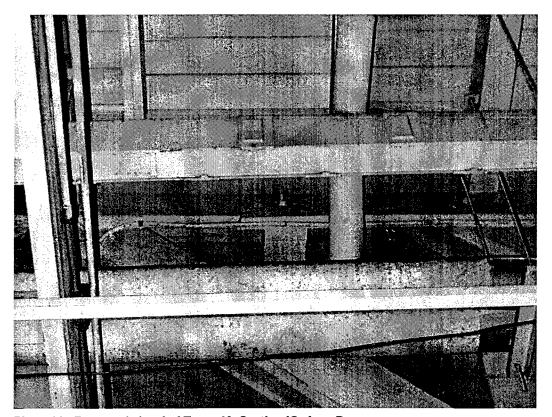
Fractured chord of Truss 40, Section IG, Area B.
